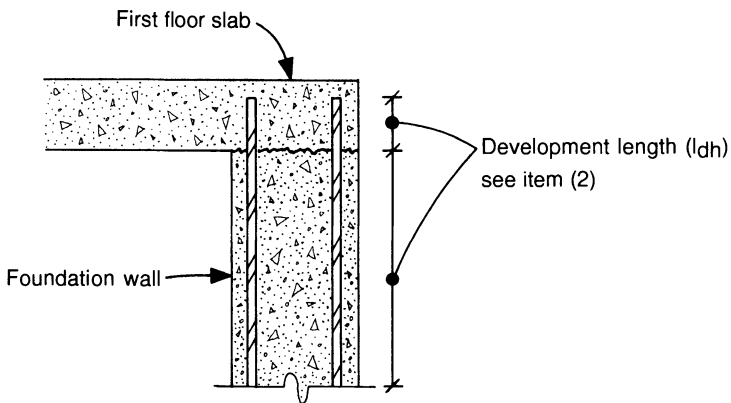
Shear friction at cold joint between wall and floor slab.
